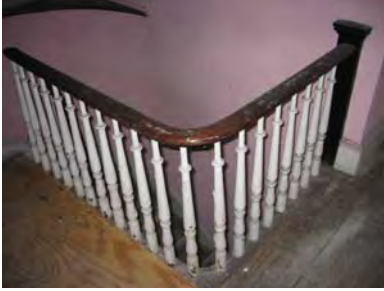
Railing return at second floor. (Photo: BBB, 2006)
